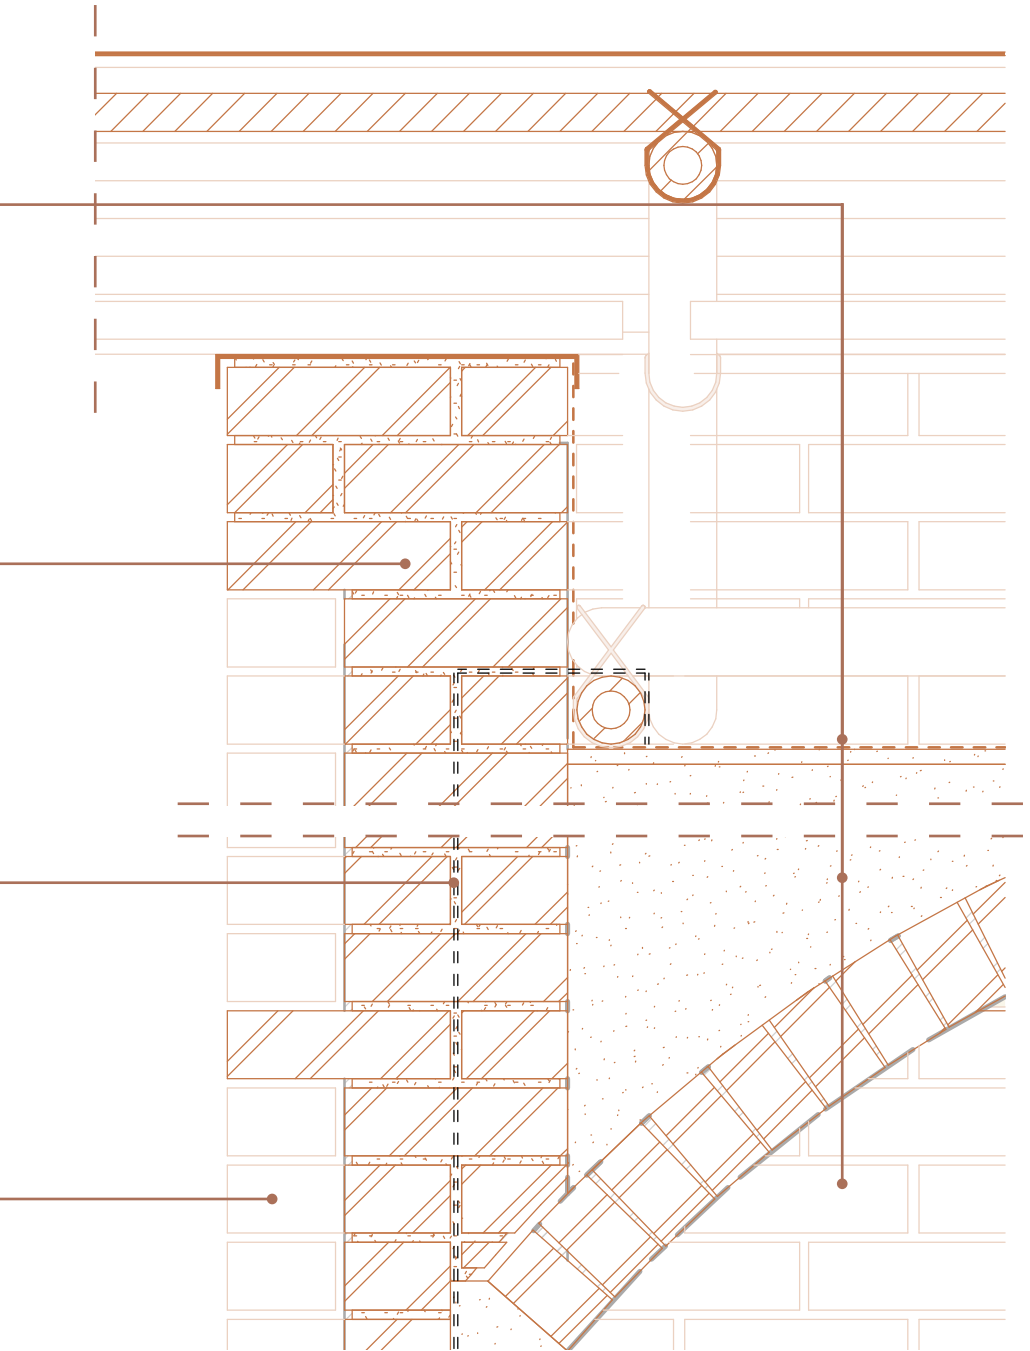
Detail Roof (non-accessible) [Scale 1:10]
